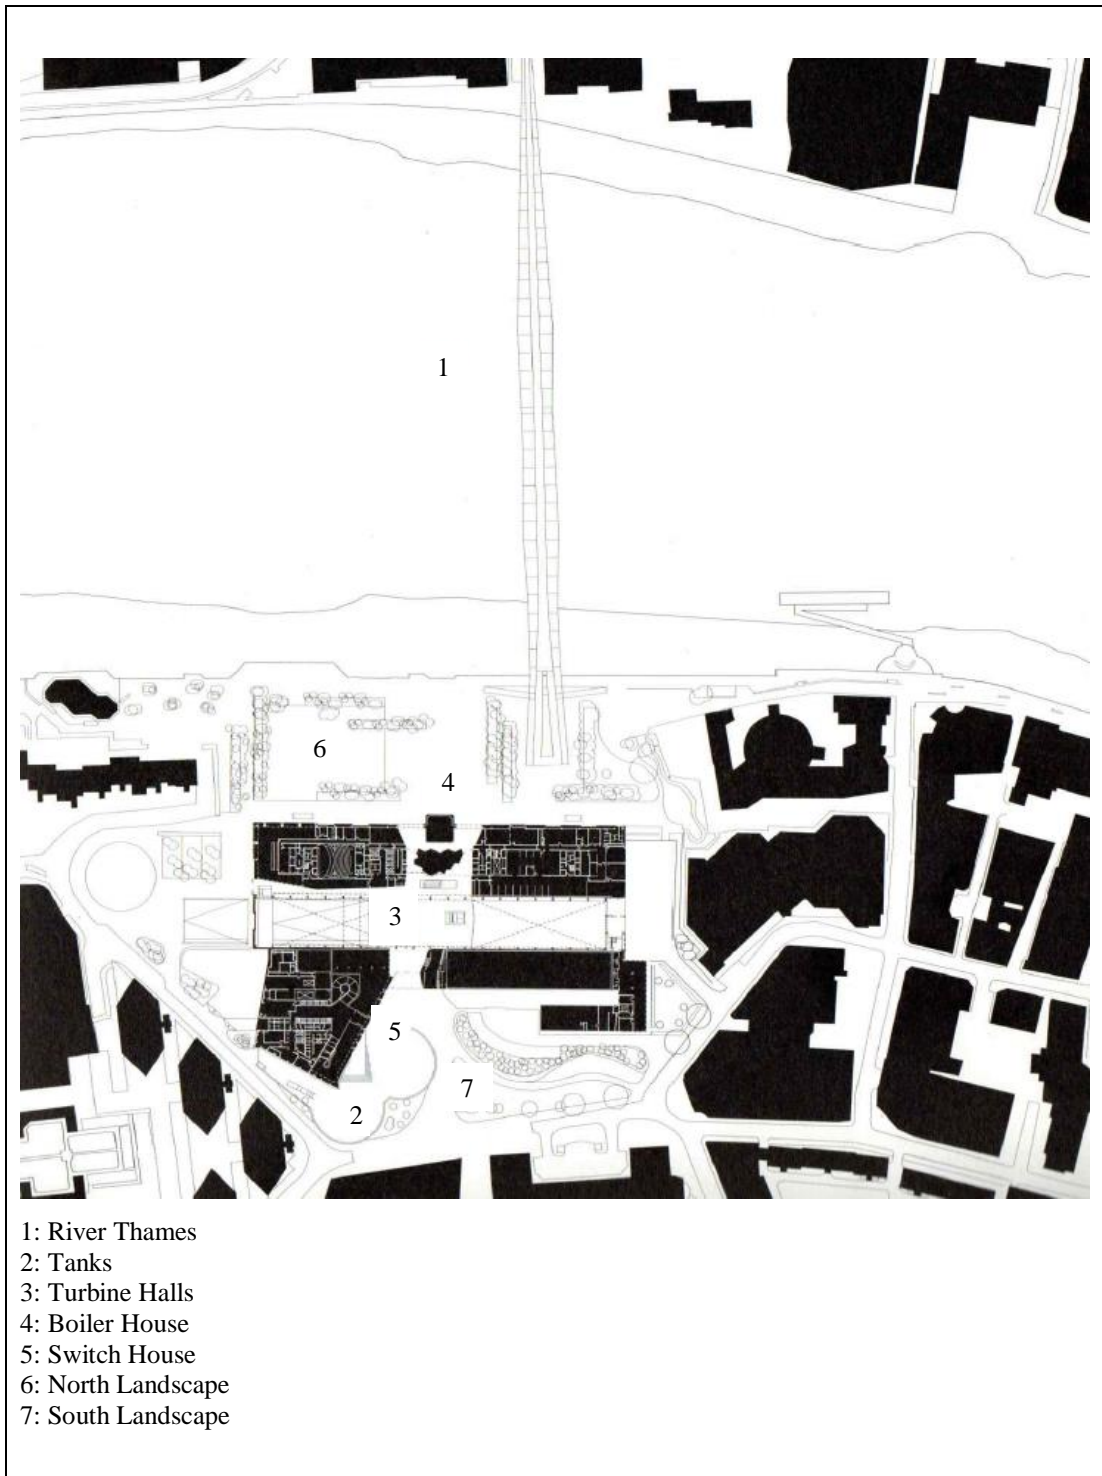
6. Site Plan of the Tate Modern with Its Latest Extension Switch House.
